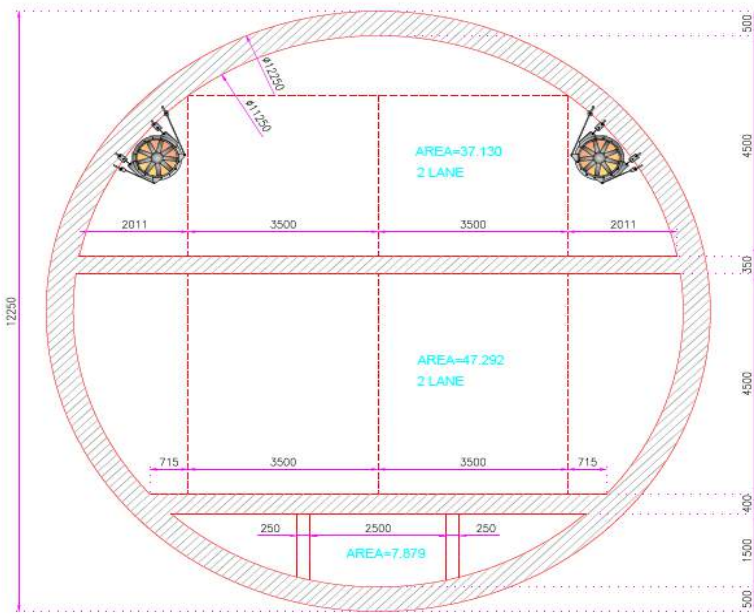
4 & 5-lane Road TBM Tunnel Typical Cross Section
